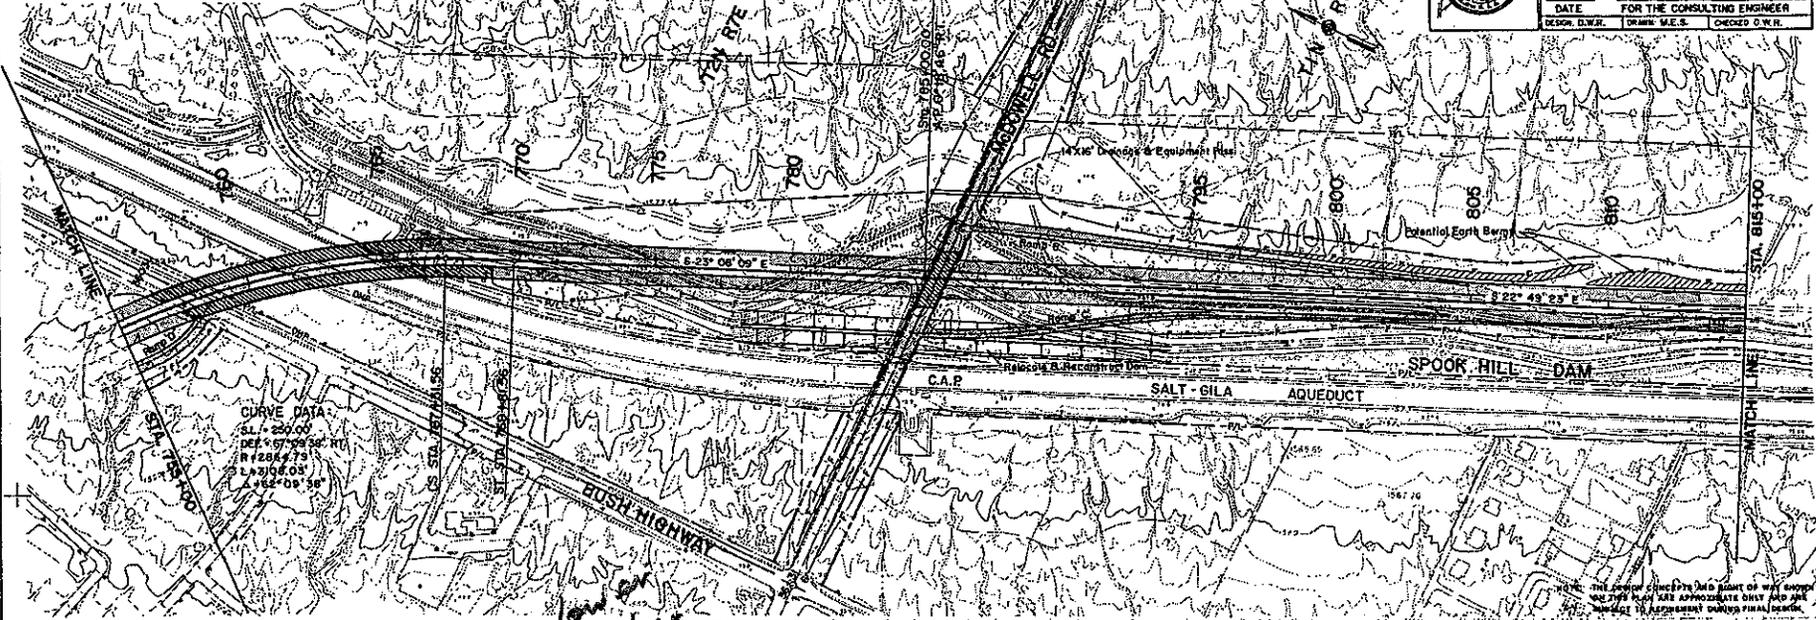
SINGLE PLAN - PROFILE - 10/11/88
